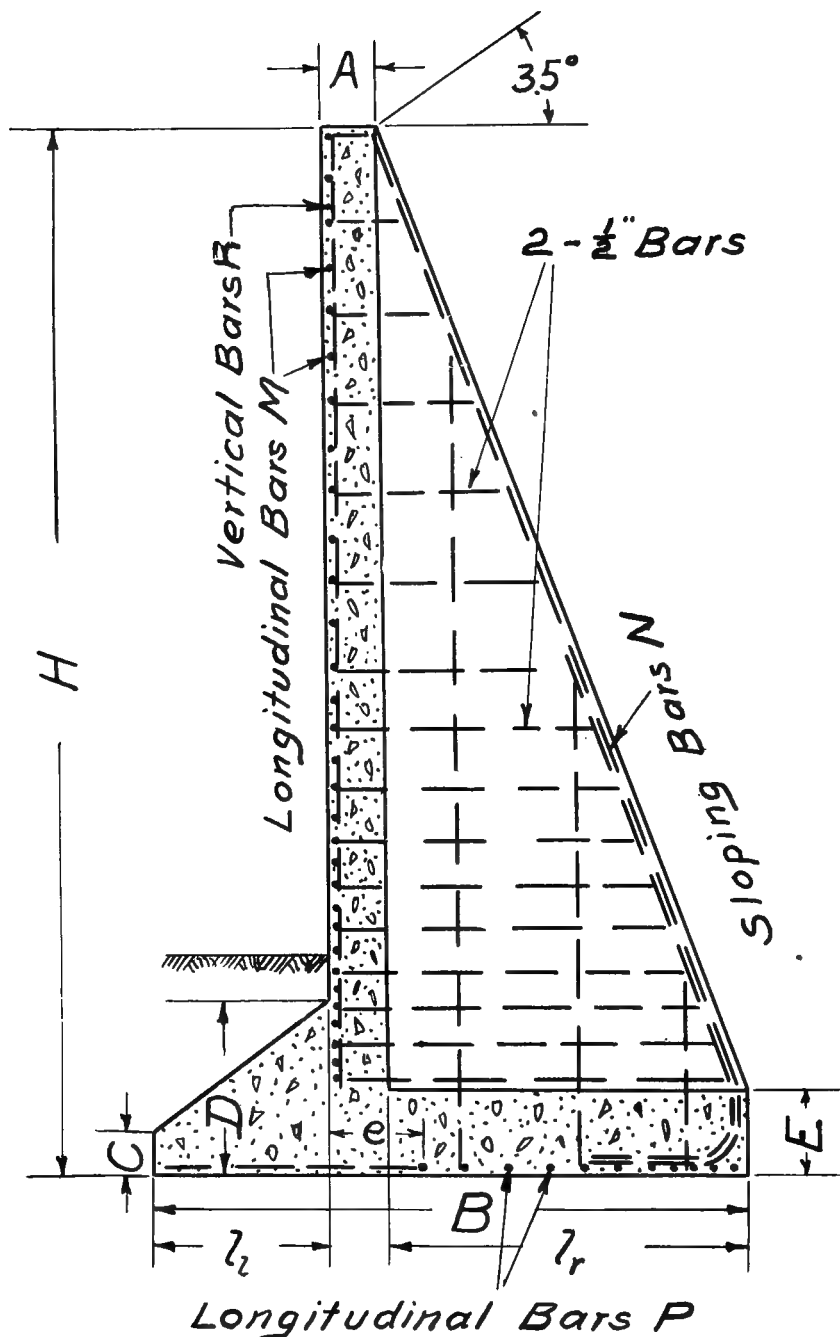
DESIGN OF COUNTERFORT TYPE OF RETAINING WALLS
